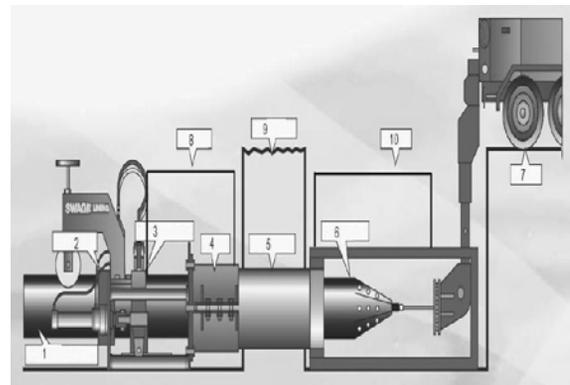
Idea of renovation in swagelining method [15]: 1 – new PE pipe, 2 – reducing die, 3 – hydraulic pusher, 4 – clamp, 5 – original pipe, 6 – towing cone, 7 – winch, 8 – entry pit, 9 – ground level, 10 – exit pit
